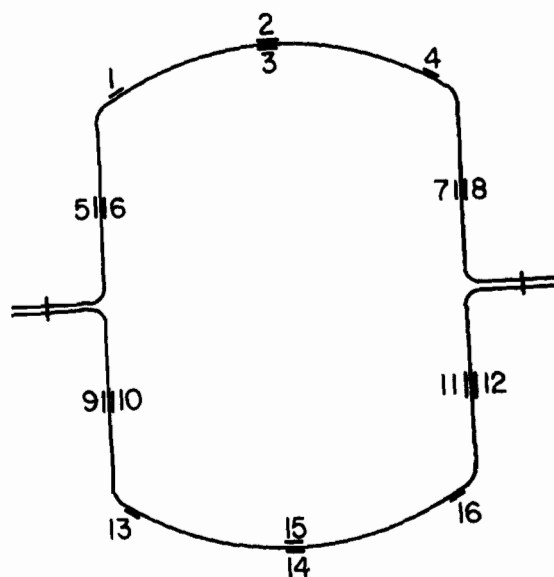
Location of Strain Gages on ASI Stub Column Specimens
